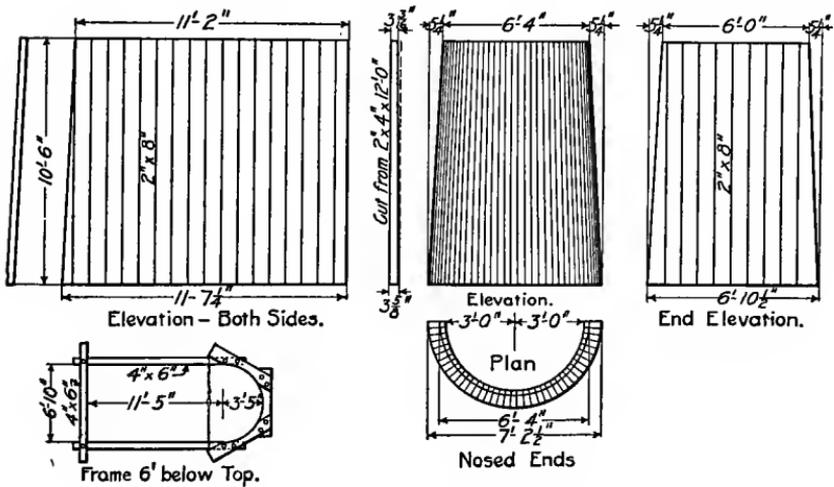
FORMS FOR CONCRETE PIER. K.-C. M. & O. R.R.
